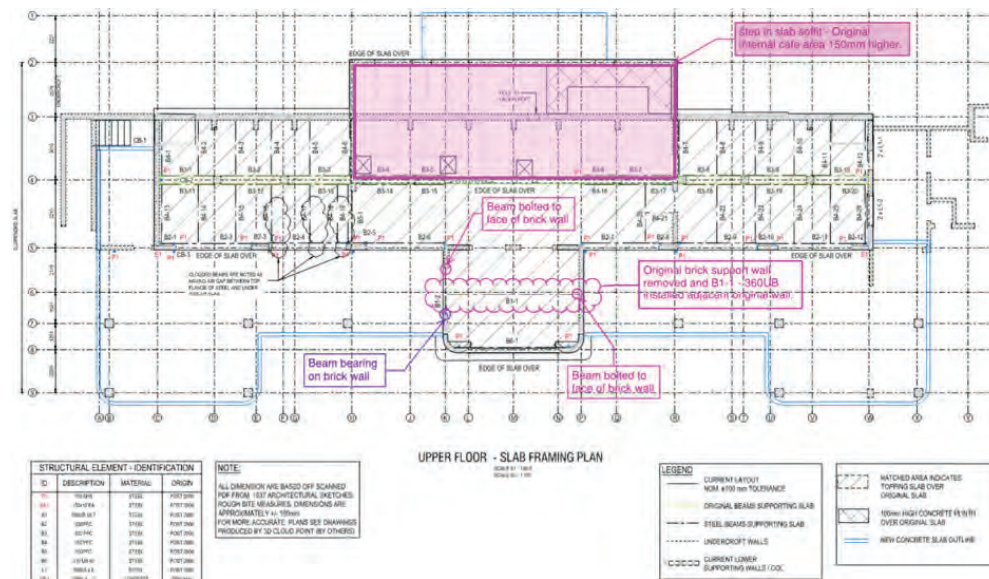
Plan showing area of upper floor that was raised, steel beams supporting slab and steel beam connections to brick walls of most concern
